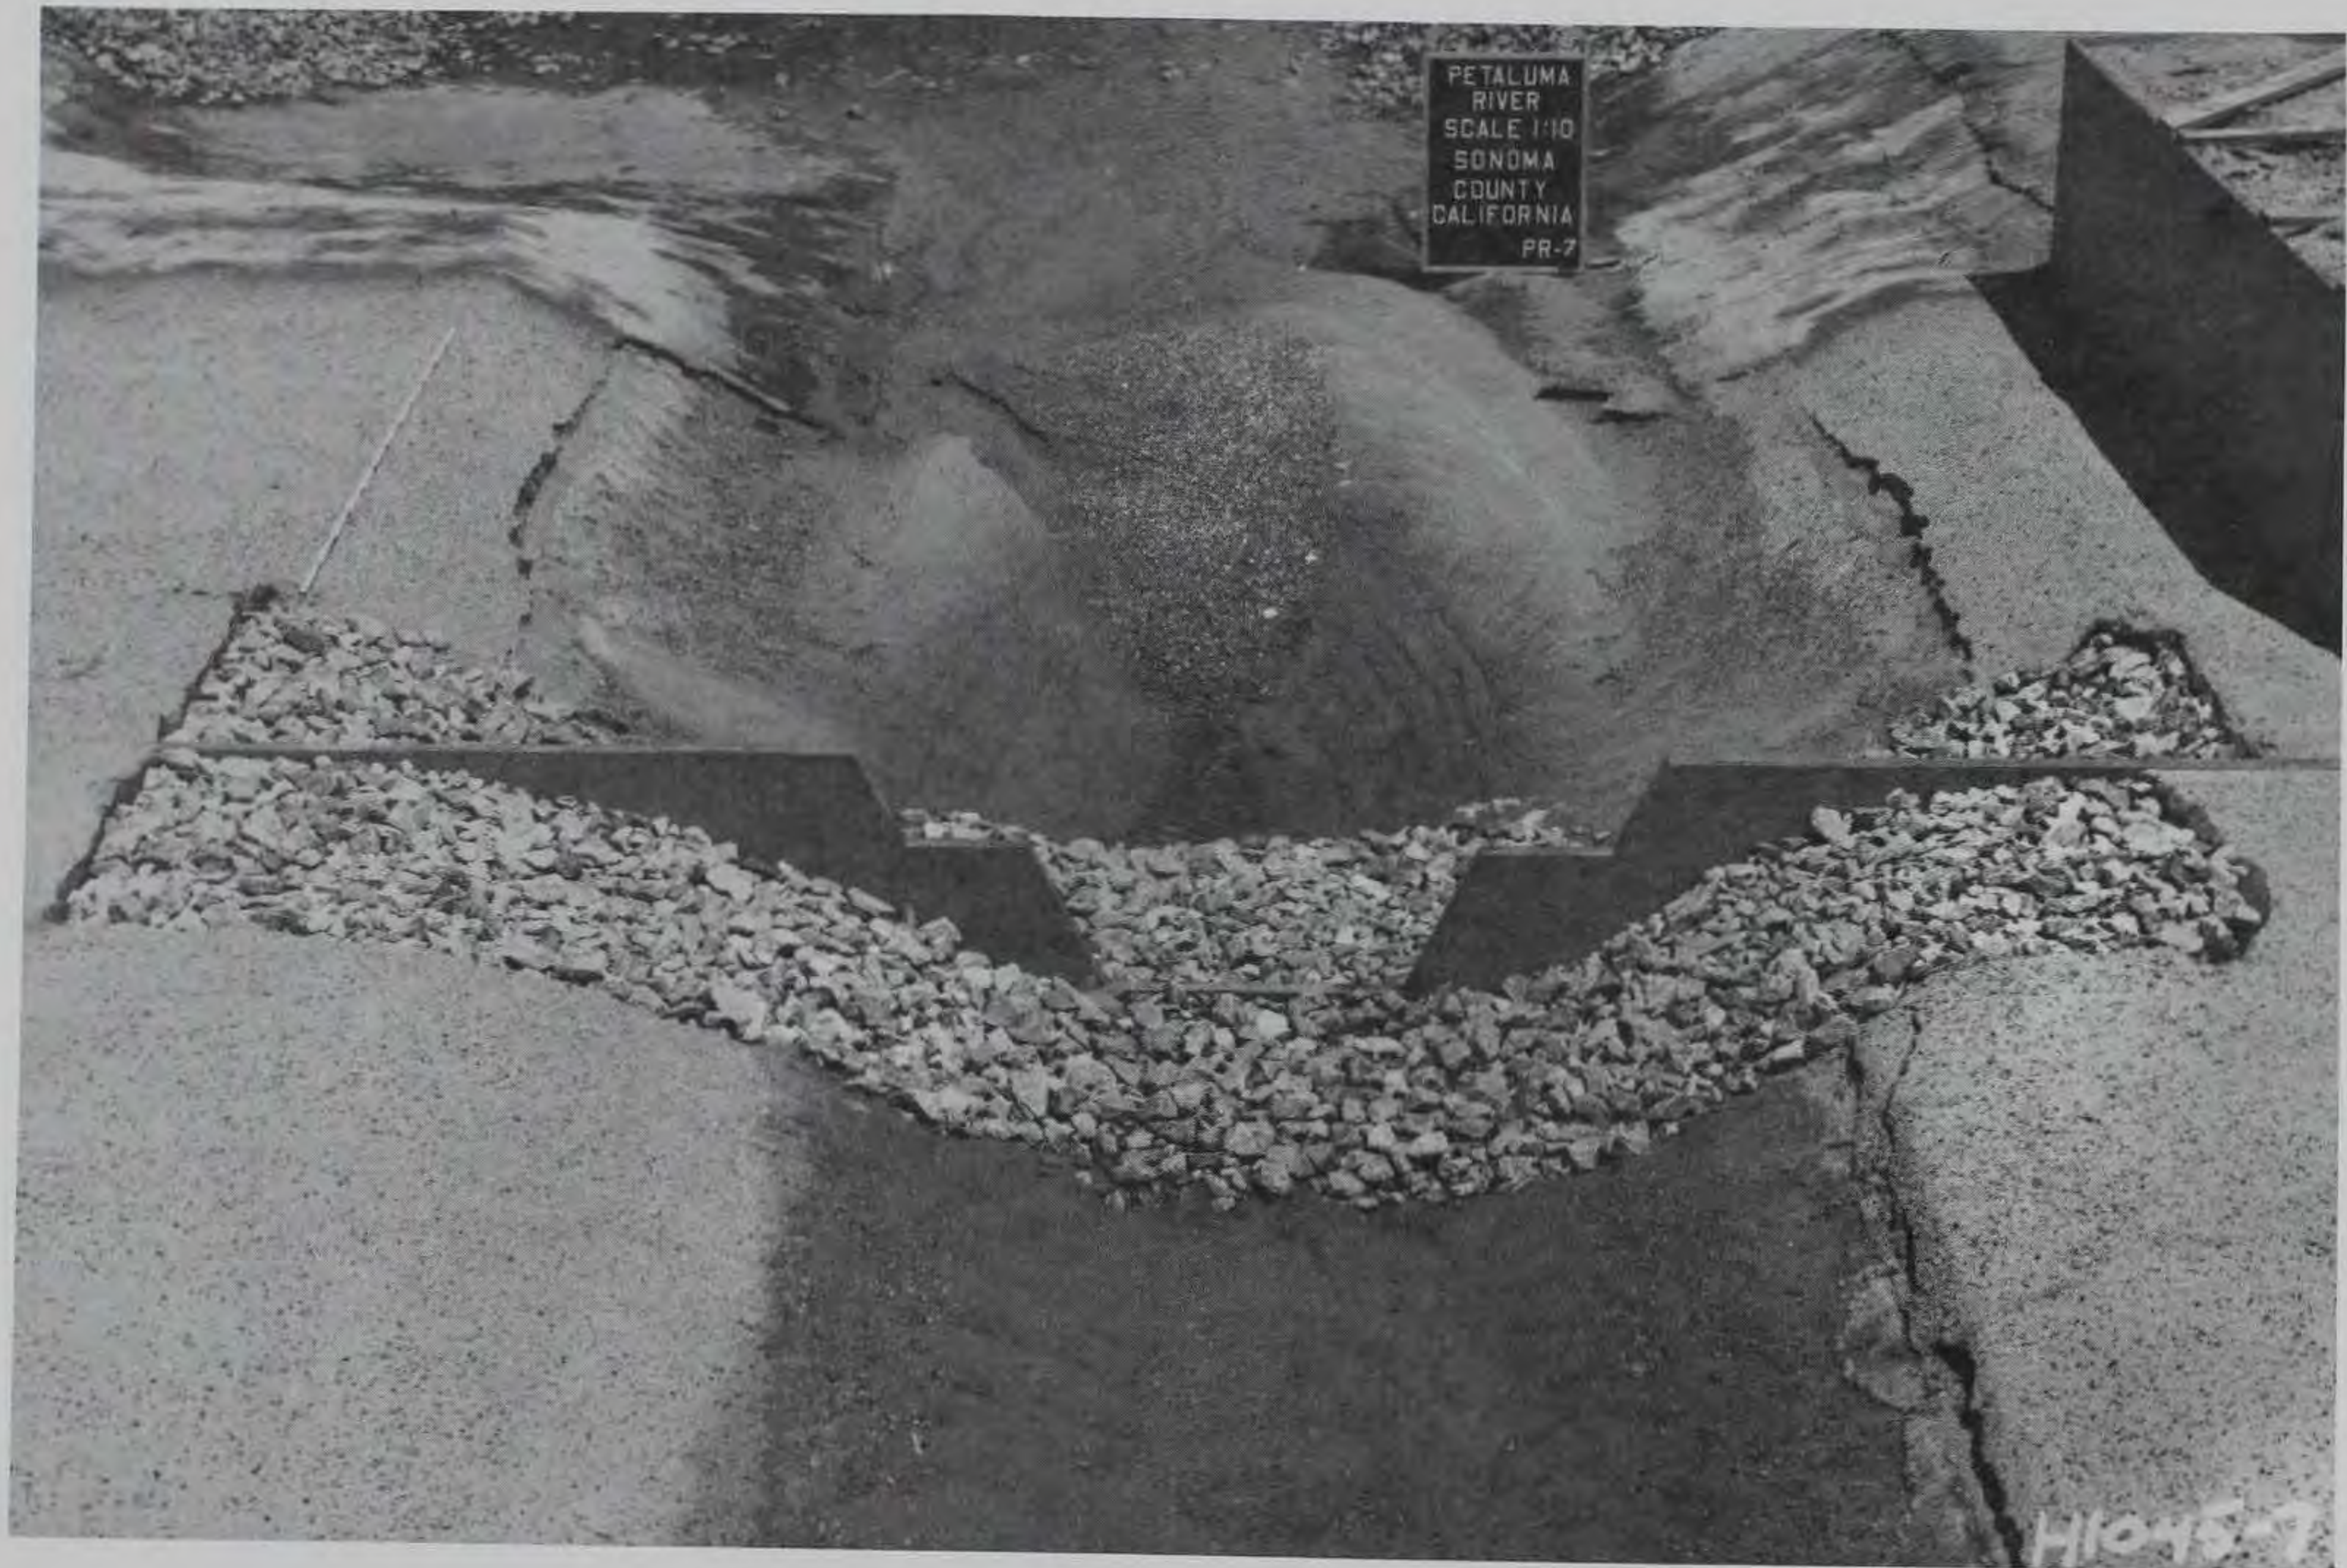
Riprap failure, downstream view; same flow conditions as shown in Photo 1
